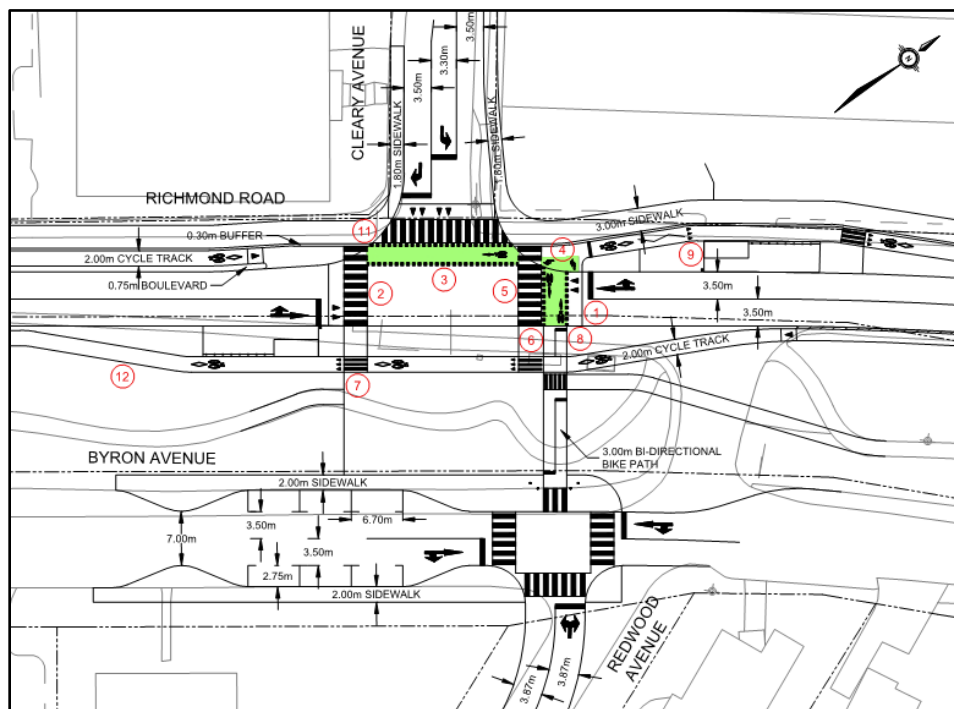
Richmond Road Complete Streets - Cleary Avenue Intersection
